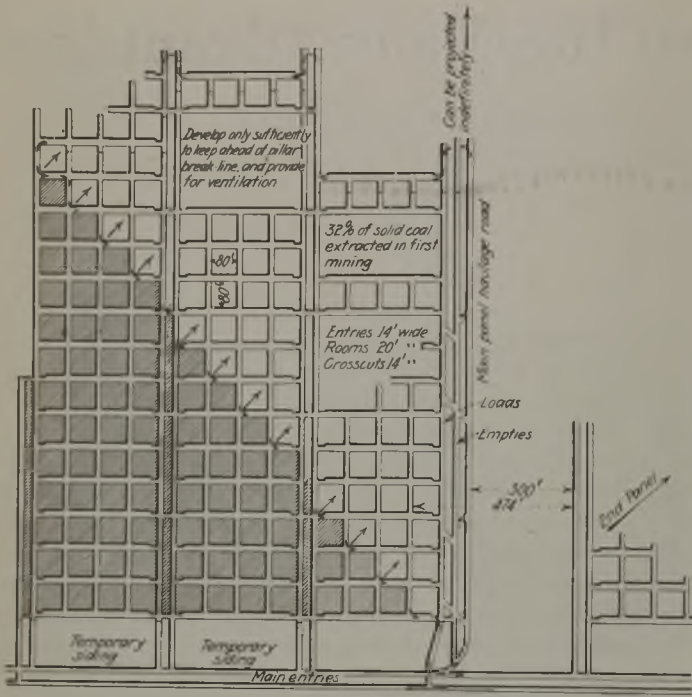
Block System Particularly Adapted to Mechanical Haulage
